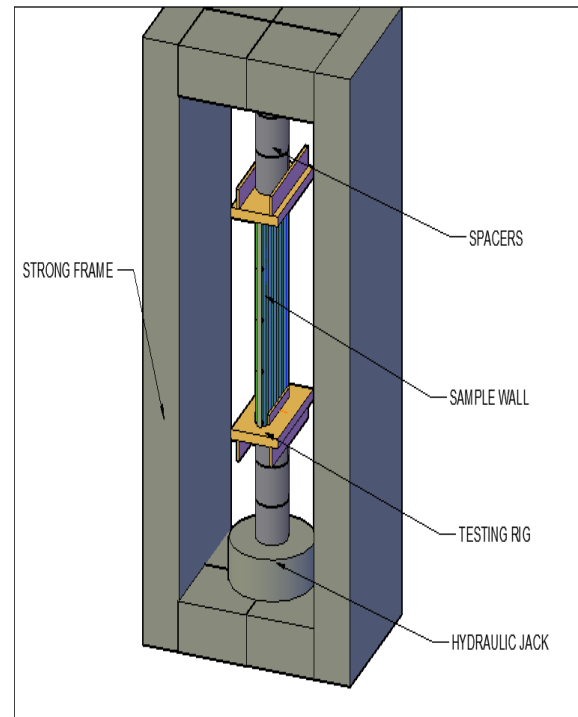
Axial loading test setup for steel sheet and profiled concrete walls
